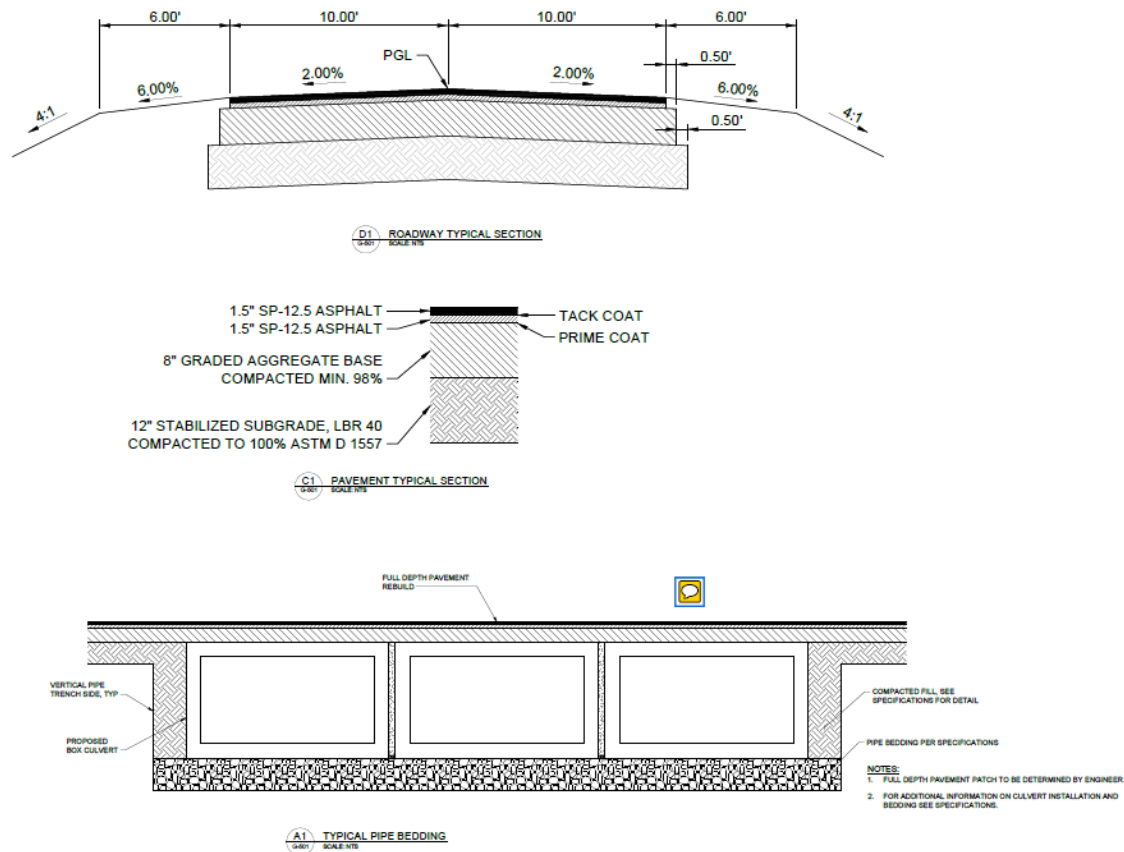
Oyster Bay Preliminary Culvert Design Plan
